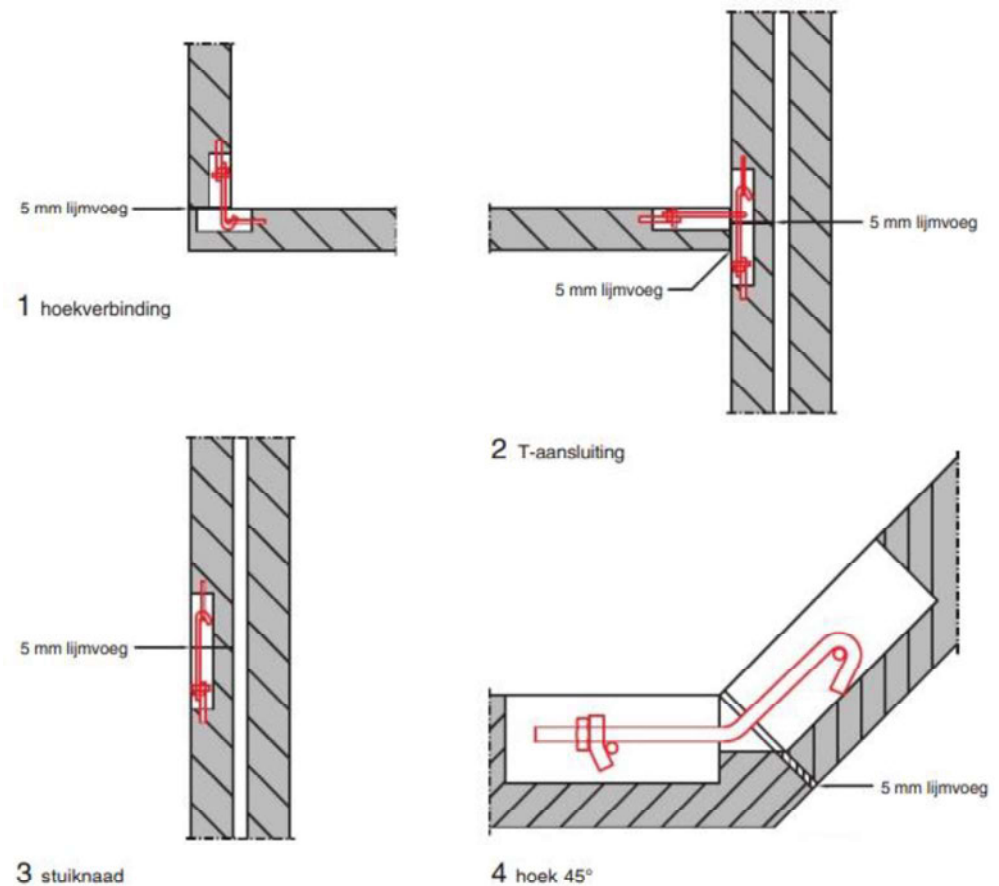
Wall-wall connections; adapted from [Jellema, 2005b].
